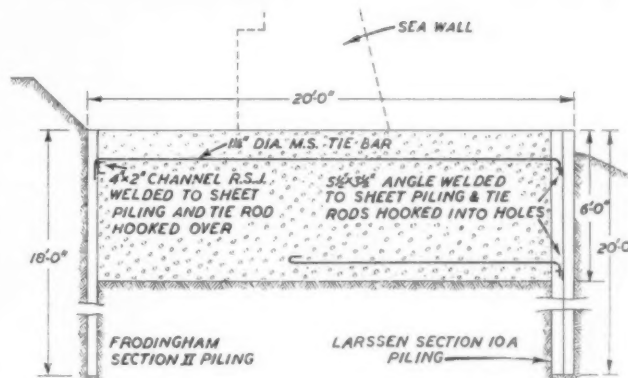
Cross-section of sea wall foundation, showing arrangement of tie-bars.
